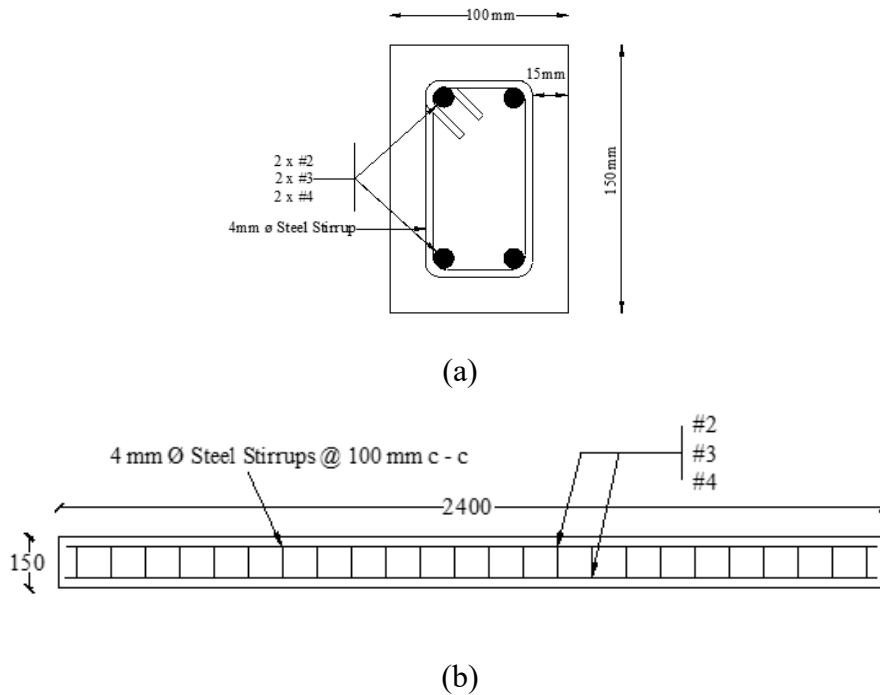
Details of the tested GFRP-RC beams: (a) Cross-sectional view (b) Side view
